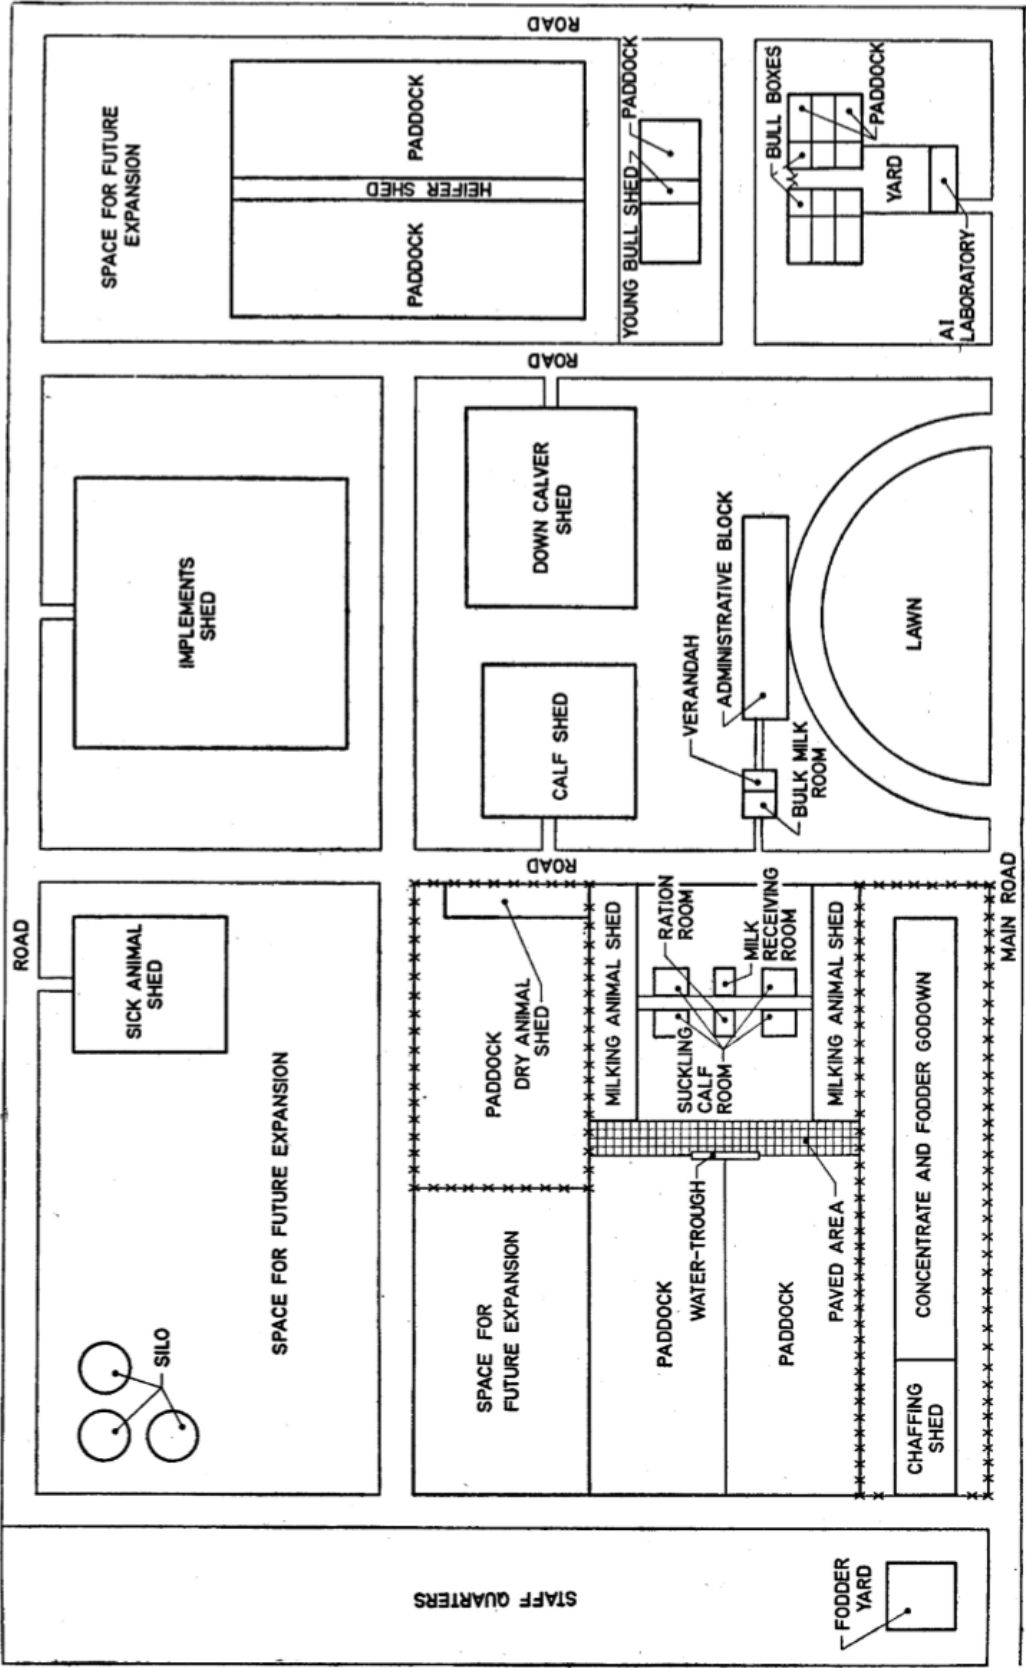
A LAYOUT PLAN FOR LARGE DAIRY FARMS
